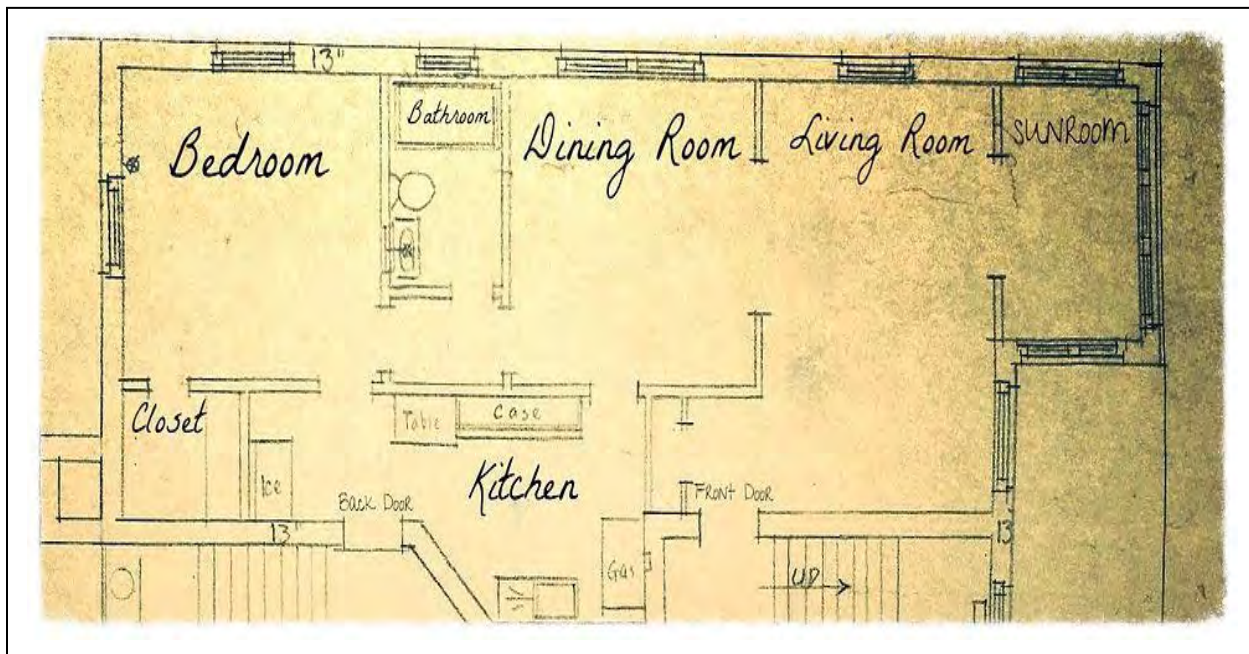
Original as built floor plan for the 1000 sq. ft. 1 bedroom units. (Pulled from original prints c.1915)
